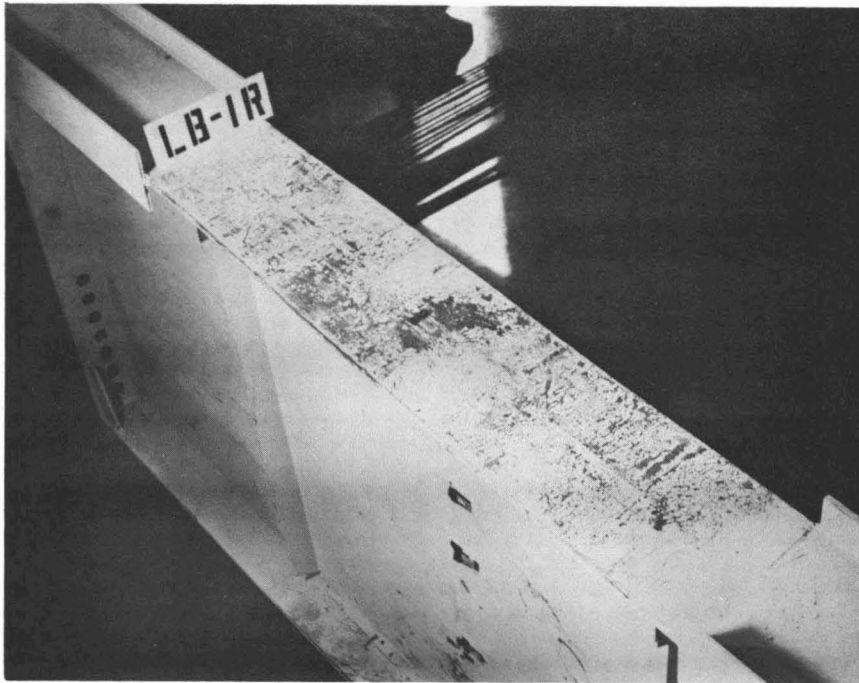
Yield Pattern on Top Surface of Compression Flange (Specimen LB1)
